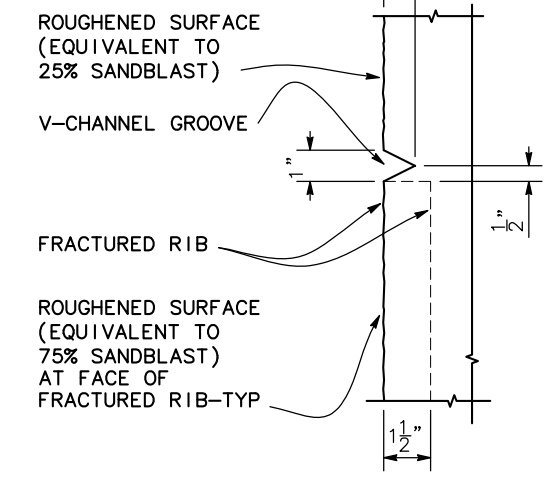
DETAIL A-FULL ARCH AND HALF ARCH PANEL
